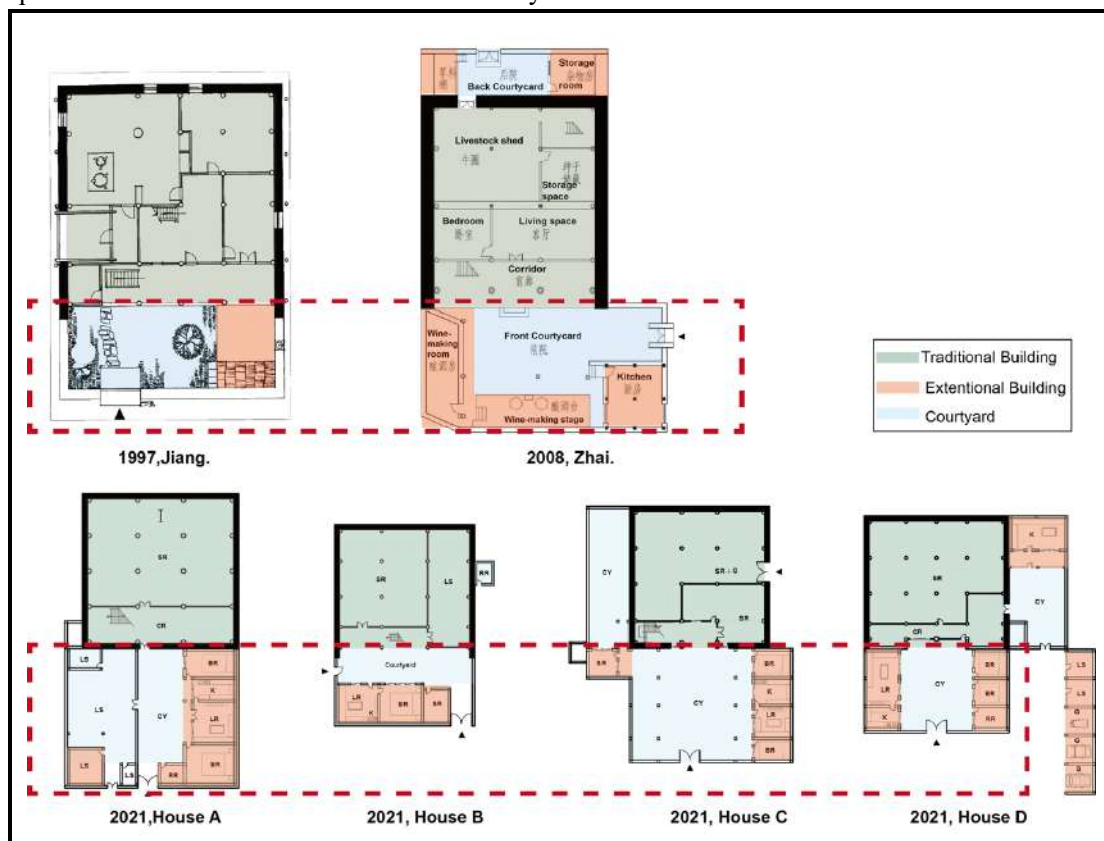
11. Floor plans of Shangri-La's Tibetan dwellings during the past decades
